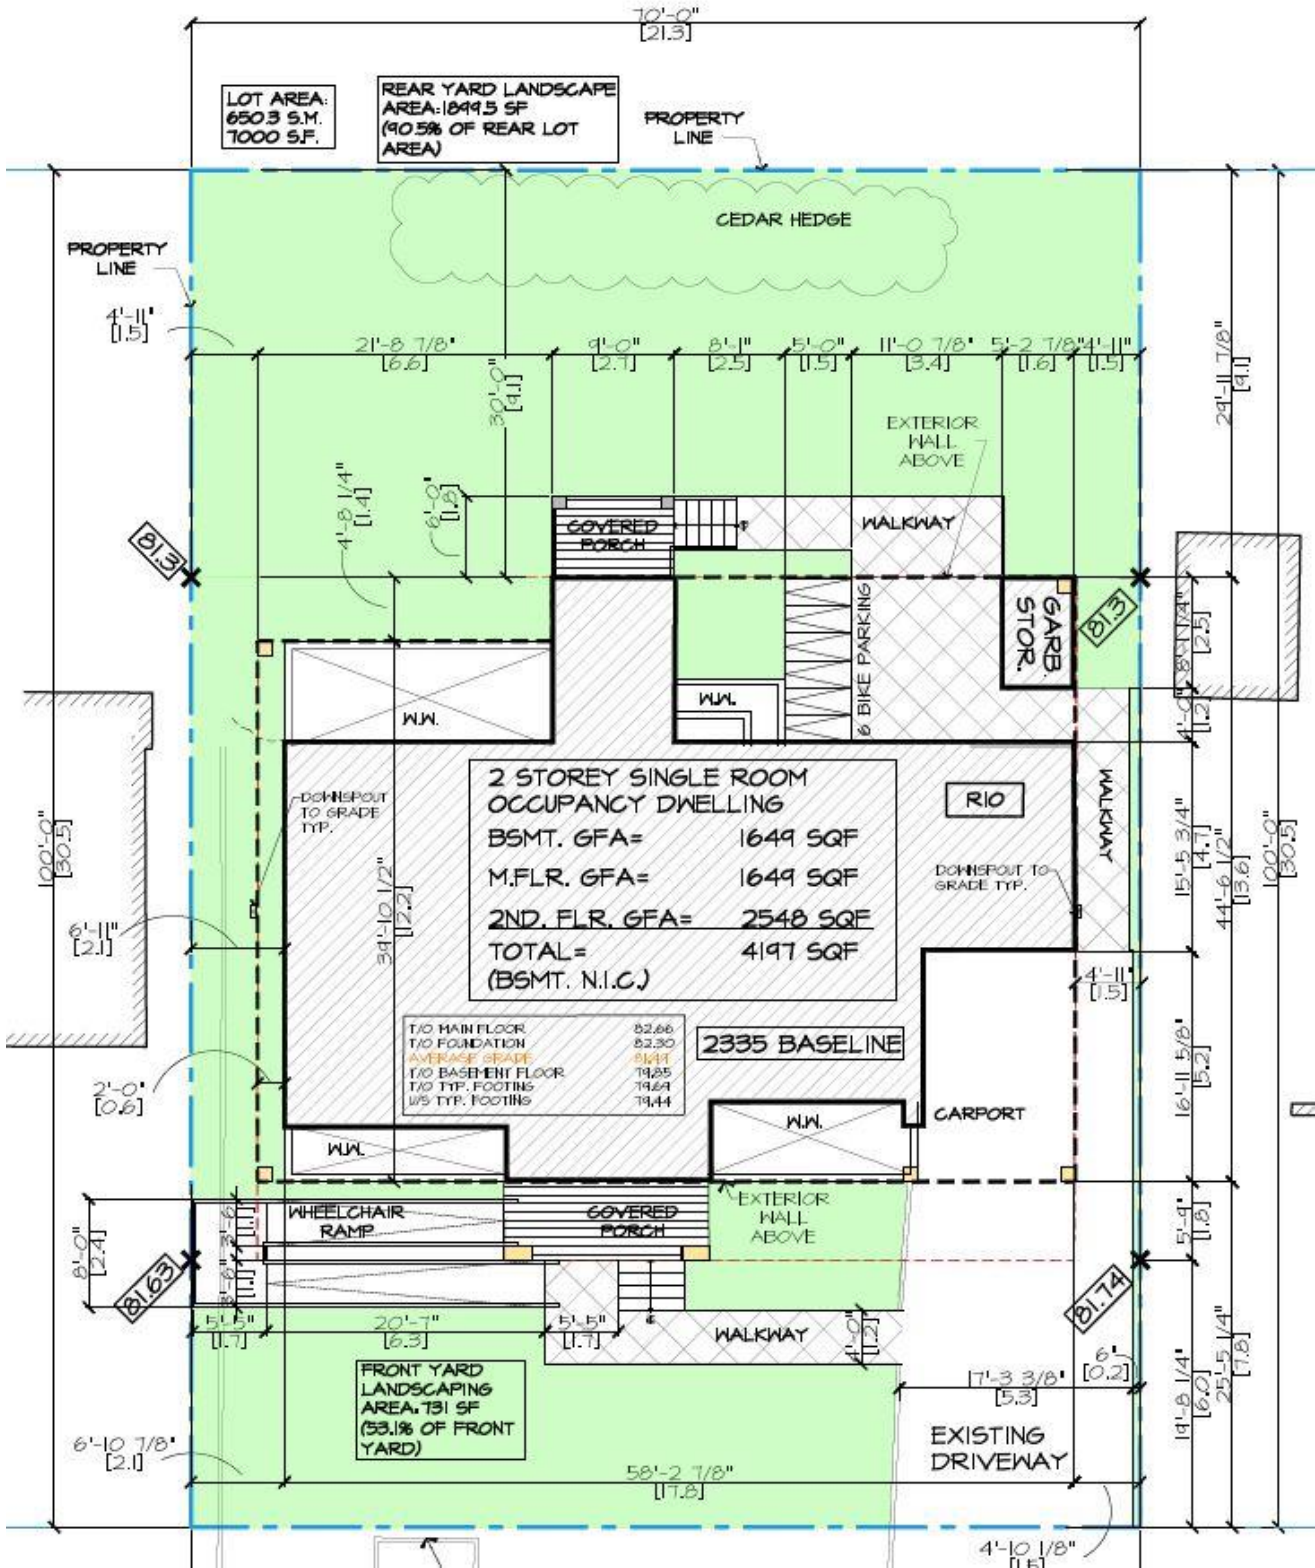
Proposed site plan (Source: Hamel Design and Planning)
